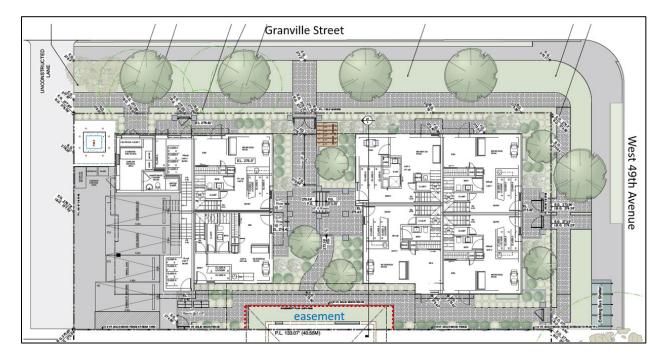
Site Plan Showing Neighbouring House and Encroachment
